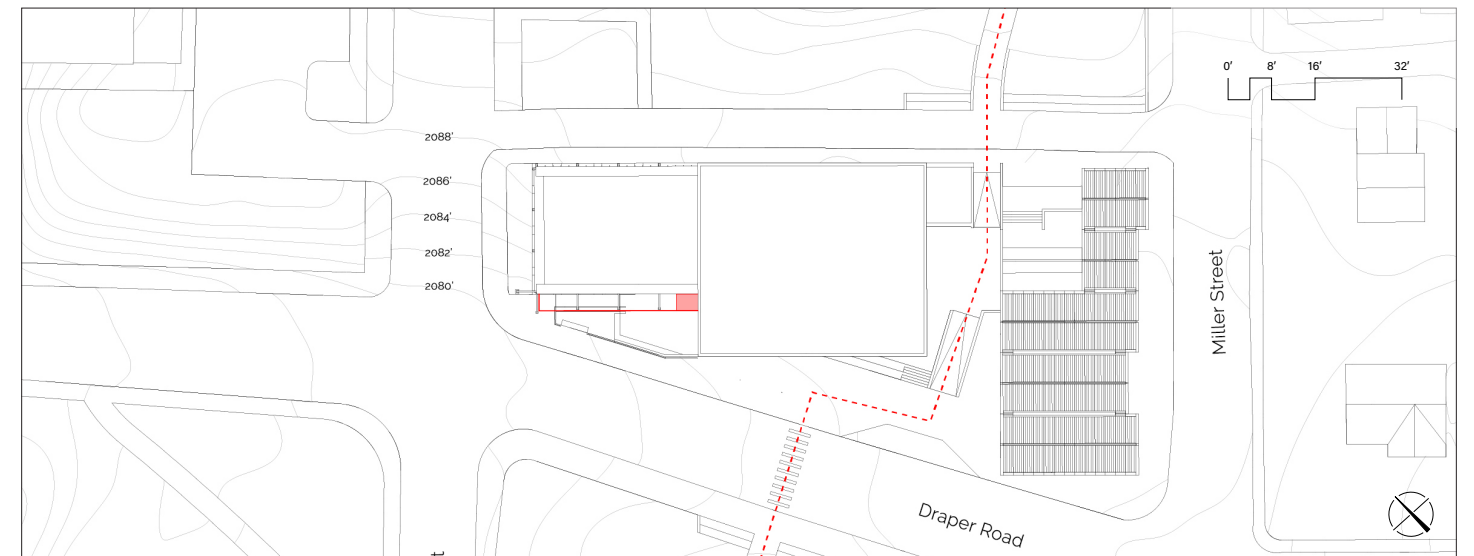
The roof plan relates the project and the surrounding buildings by scale and roof typologies.
